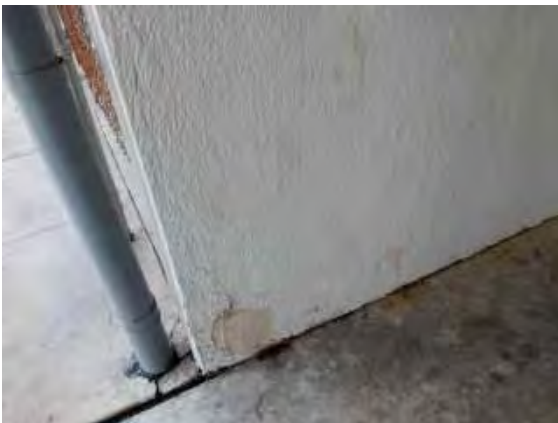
Minimal damage to the paintwork at the base of the west side of the wall.
